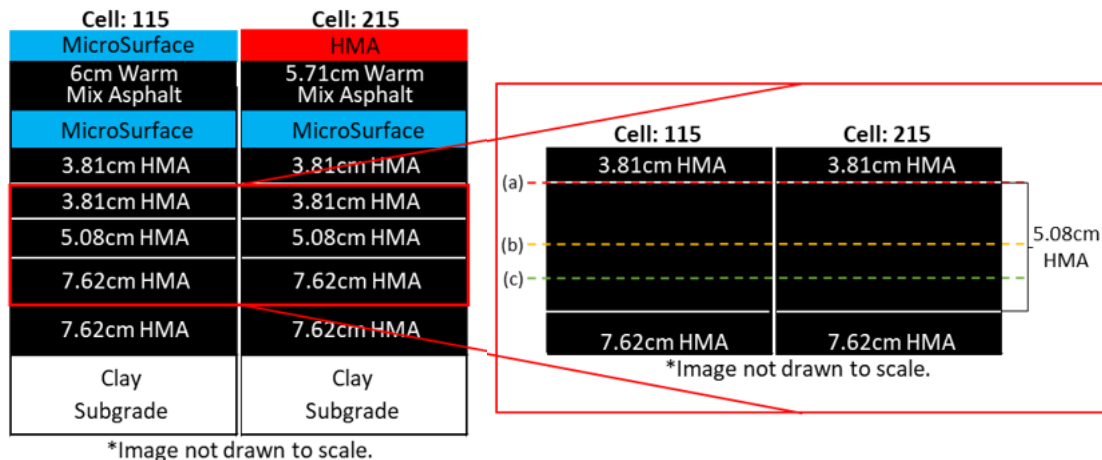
Pavement Cross-Section Cells 115 and 215
